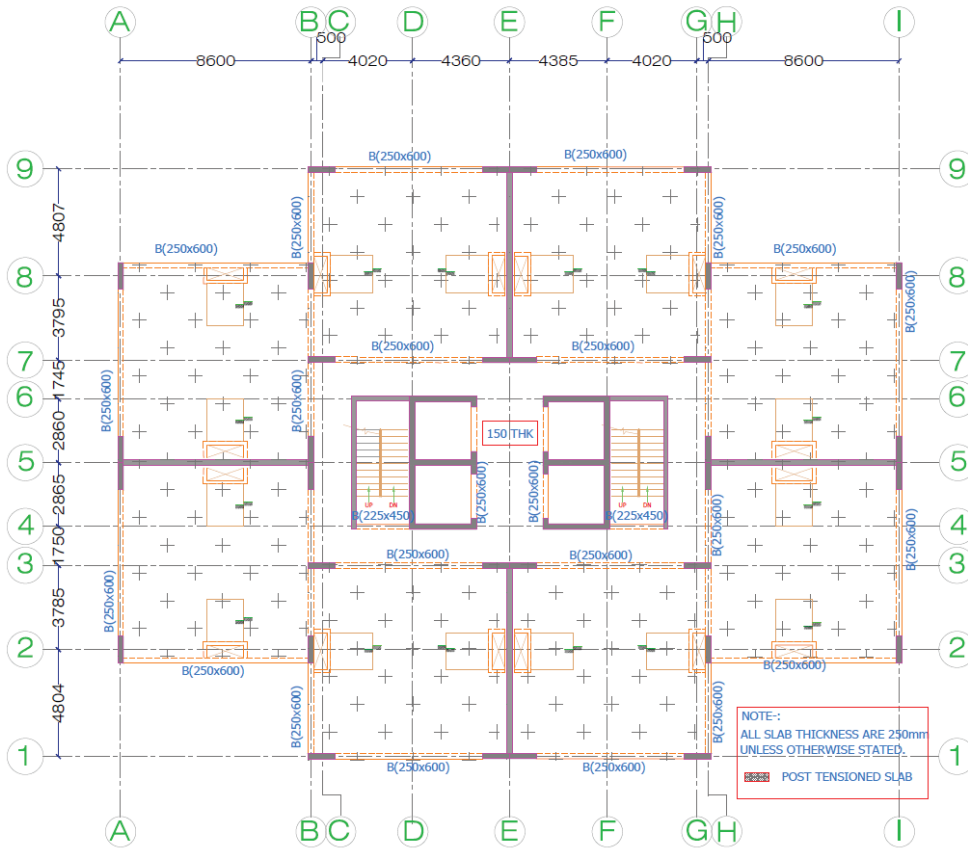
Duplex Building General Arrangement of Typical Floor Level
